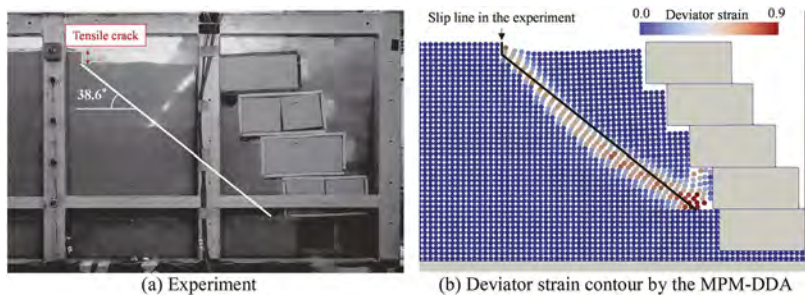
Deformation of the masonry wall when the stone 2 reached the container wall.
